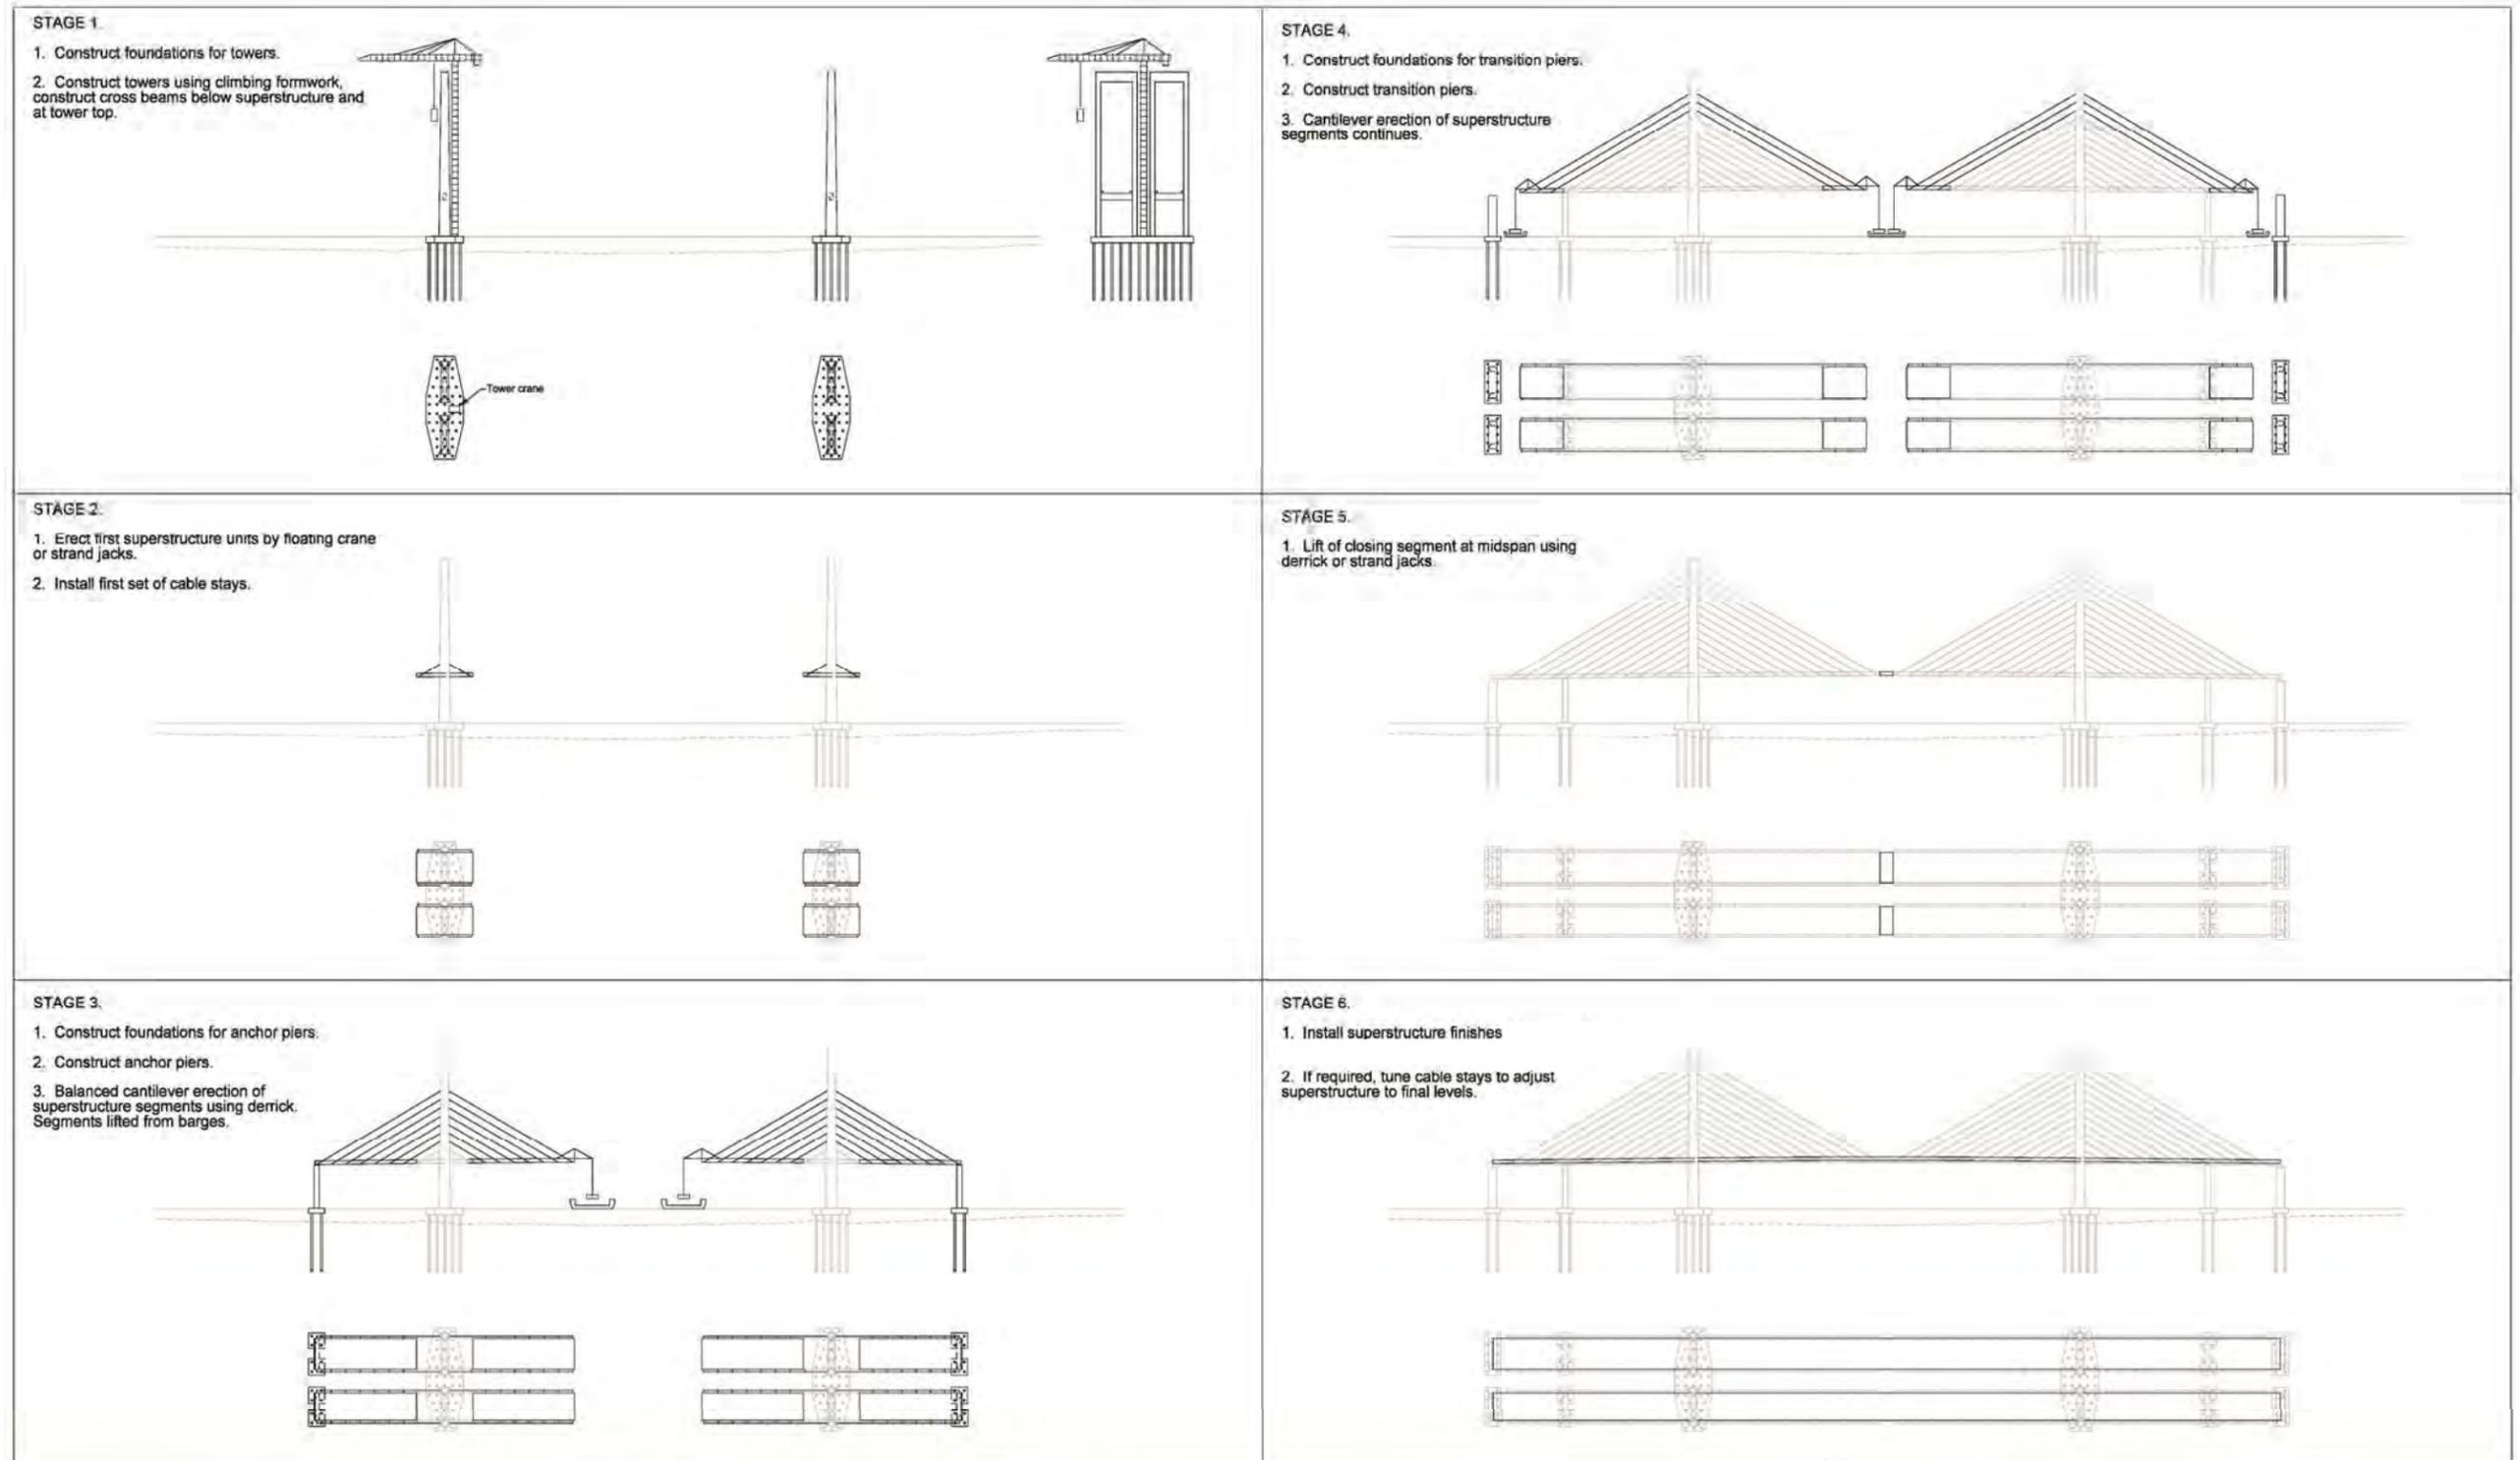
Erection of Cable Stay Long Span Bridge
